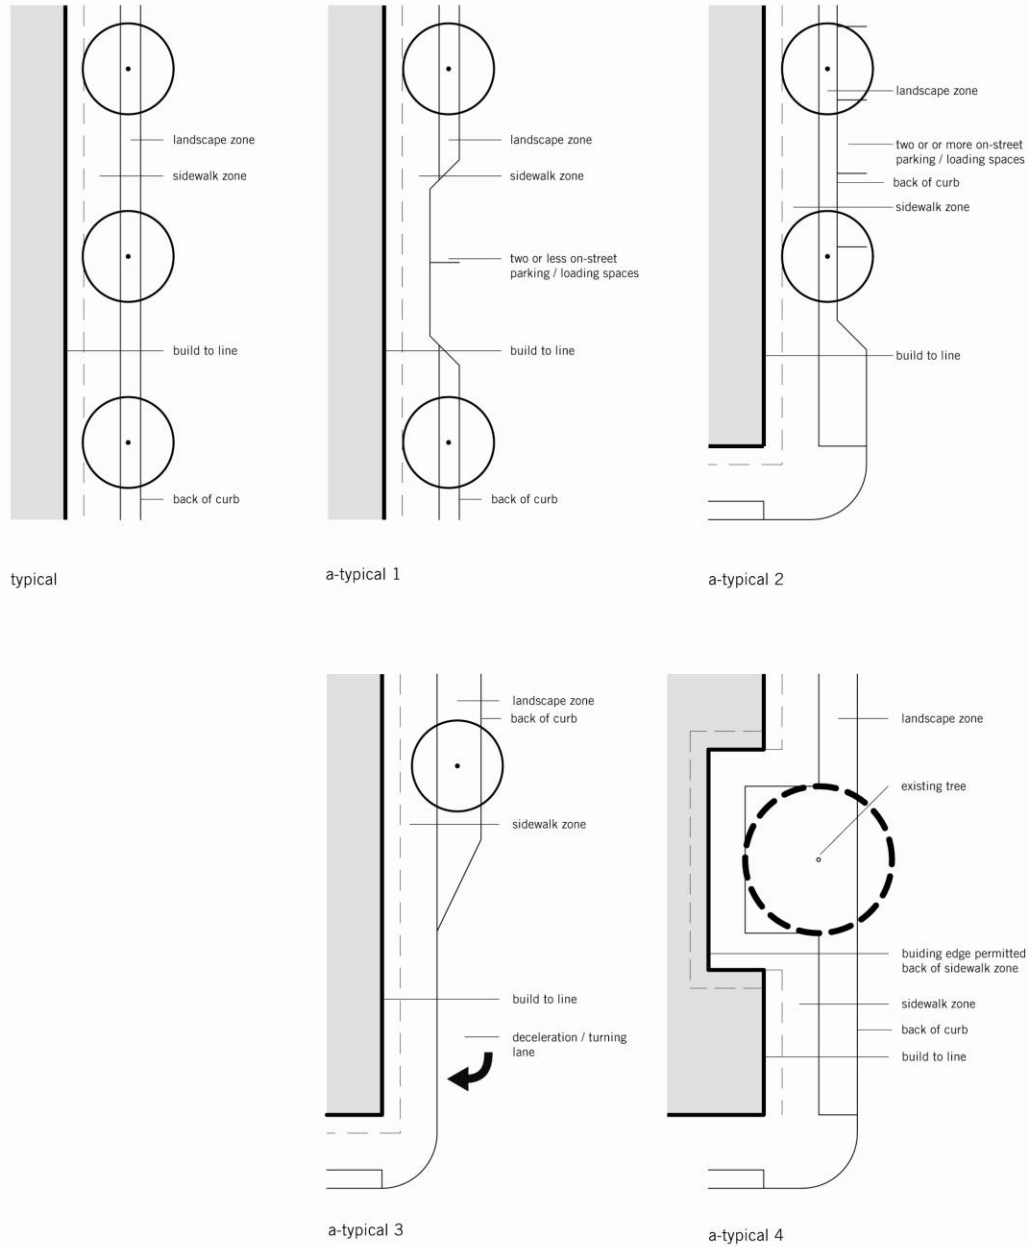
District Framework Plan - Streetscape Scenarios
